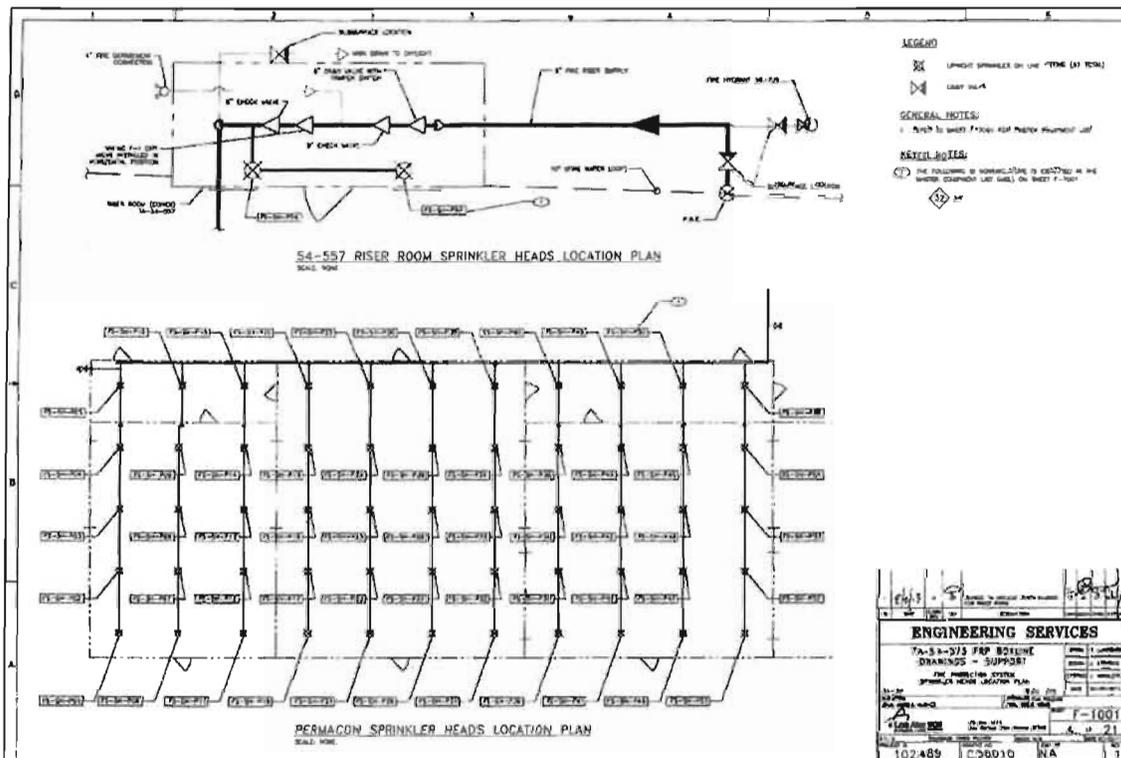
, TA-54-375 PermaCon Sprinkler Heads Location Plan
